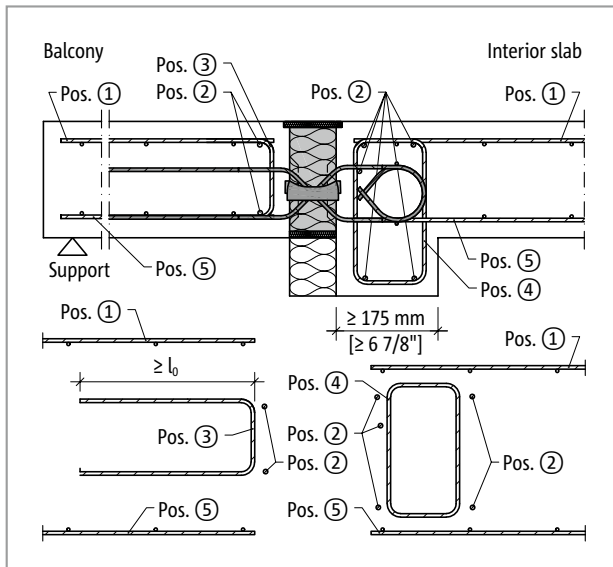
Schöck Isokorb® T Type CQ-VV1 to CQ-VV5: On-site reinforcement in downstand beam
